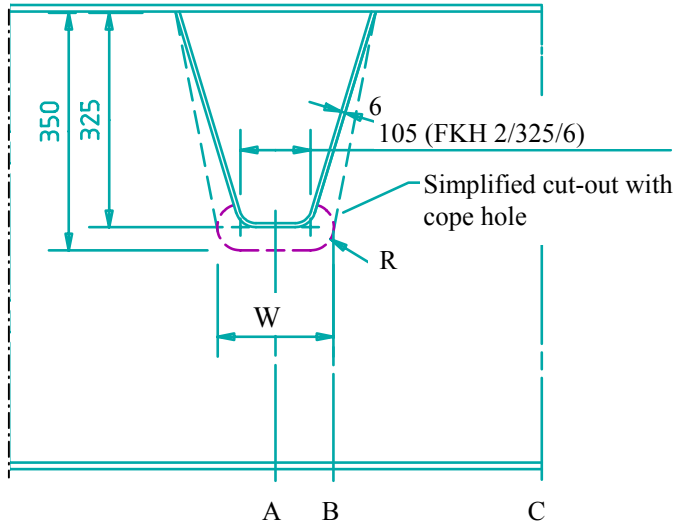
Simplified cut-out with cope hole (Dimensions in mm)
